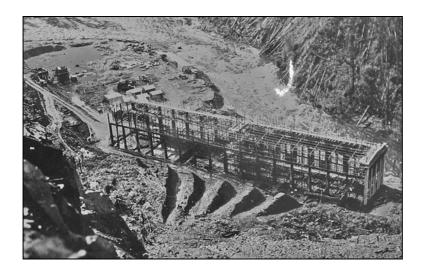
Power station under construction showing the excavations for the first five penstocks adjacent to the station The sixth trench was excavated soon afterwards (HEC collection).
